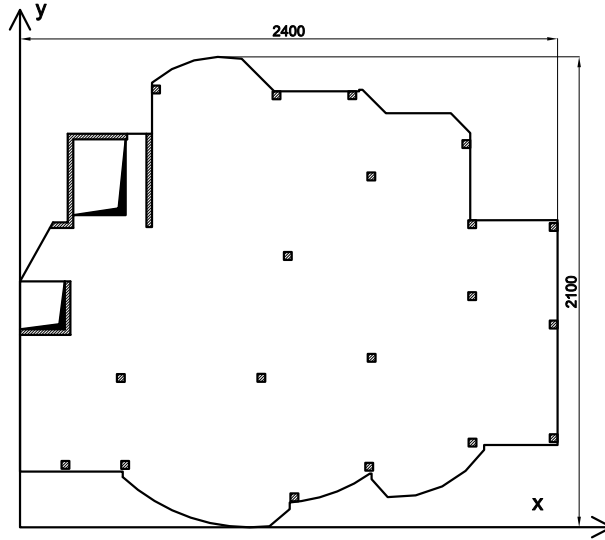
Floor plan for example 3, including the reference layout of columns, dimensions are in [cm].
